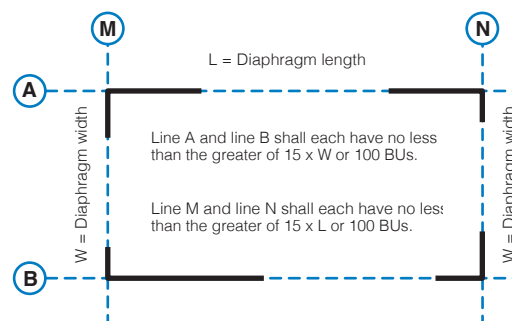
GIB® CEILING DIAPHRAGM SHEET WIDTHS AND LENGTHS
